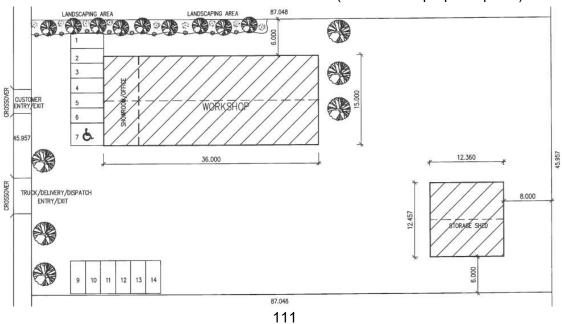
PROPOSED SITE PLAN (extract from proposal plans)
